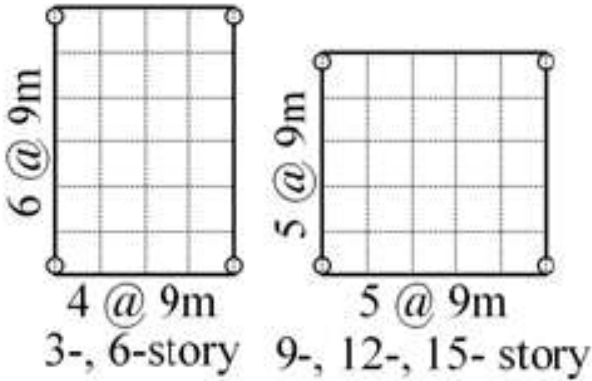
Plans of the 3-, 6-, 9-, 12-, and 15-story steel OMFs.
